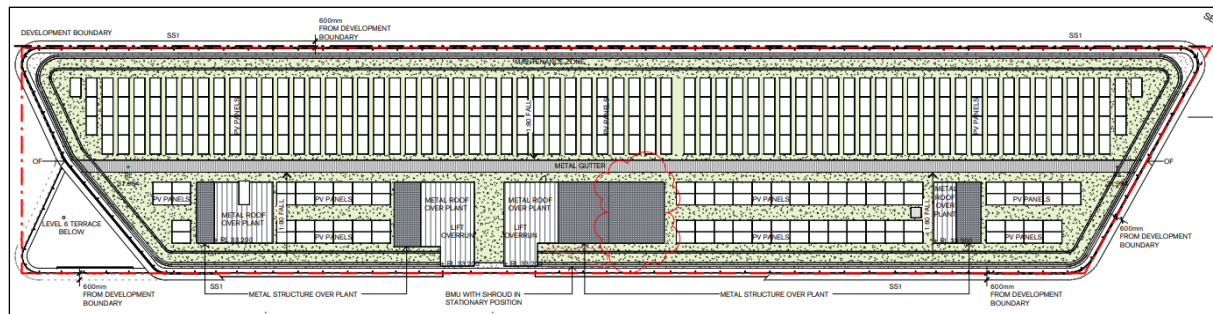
| The proposed roof plant layout with the co-generator exhaust shown by the red clouding (Source: Tzannes)
